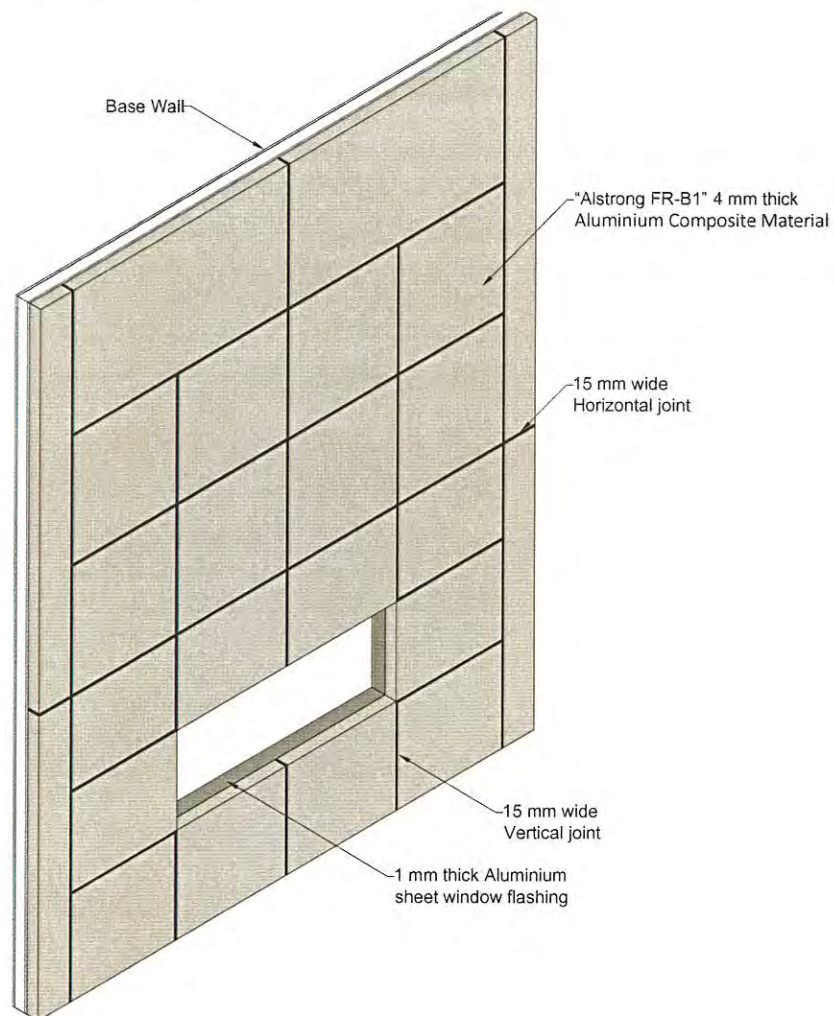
"Alstrong FR-B1" 4 mm thick Aluminium Composite Material Exterior Wall Cladding Assembly
